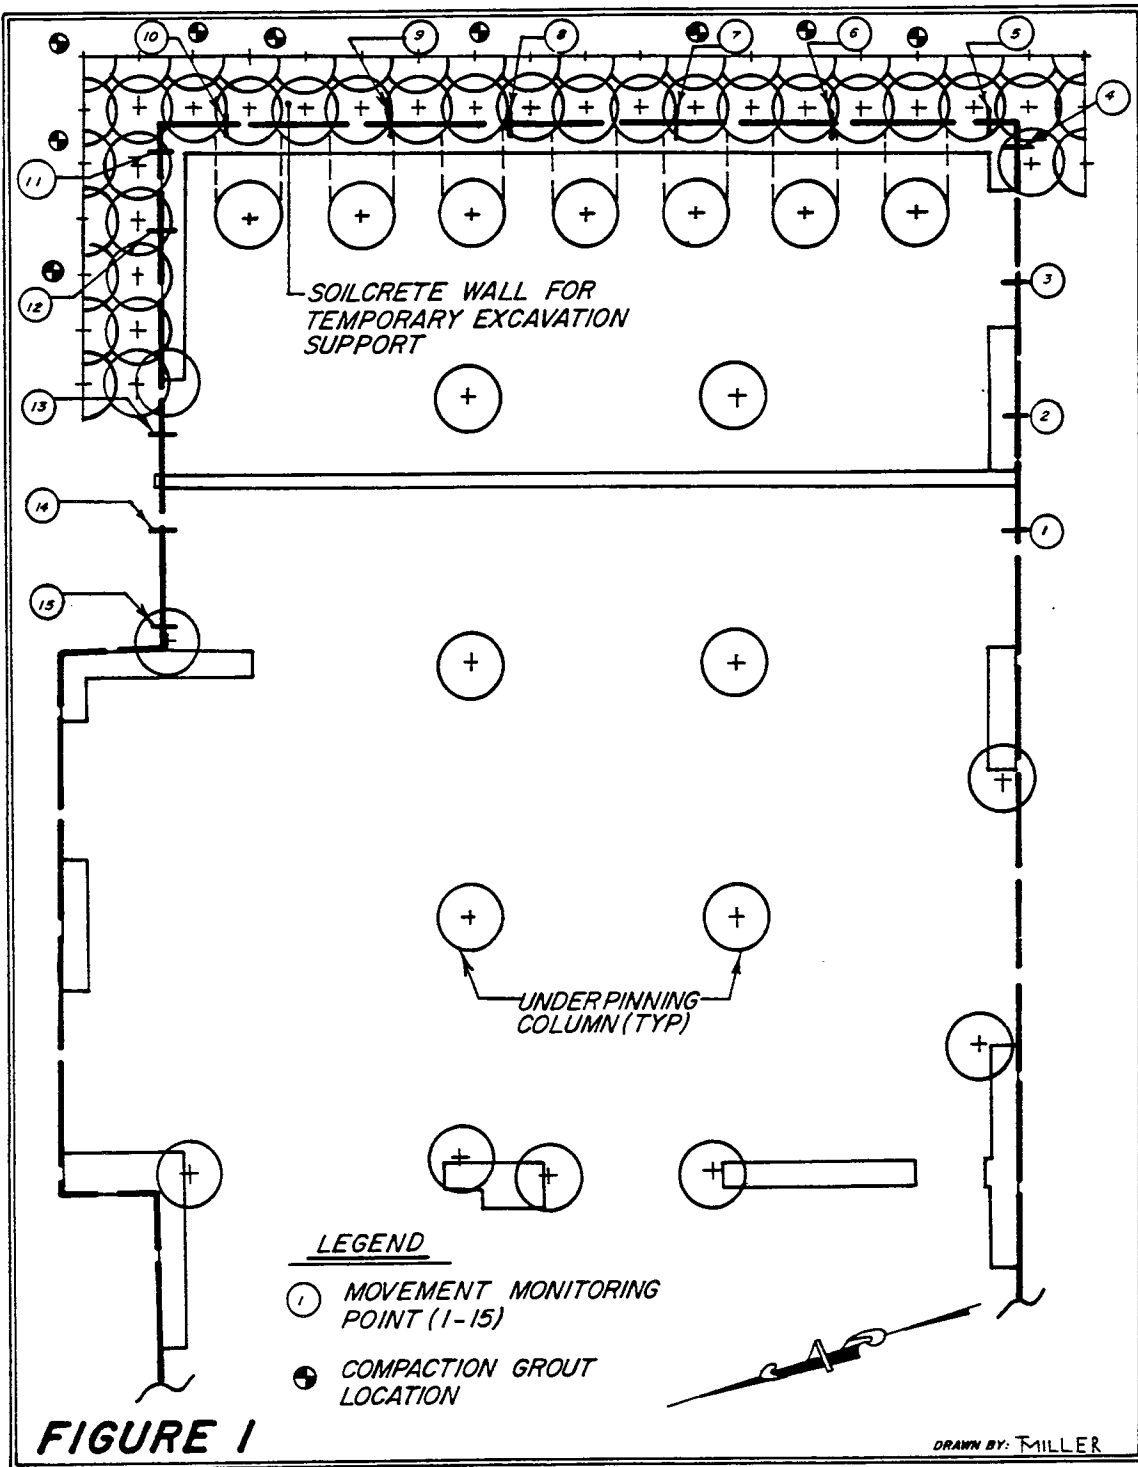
Plan view of the northeast wing of Dorothy Hall.
